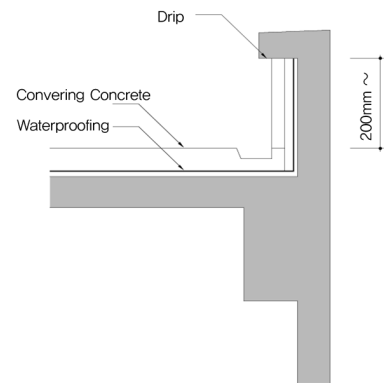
Rooftop Waterproofing Line-up Height Design Plan
